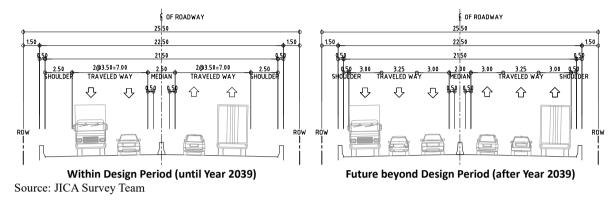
Typical Cross Sections of 4th Cebu-Mactan Bridge
